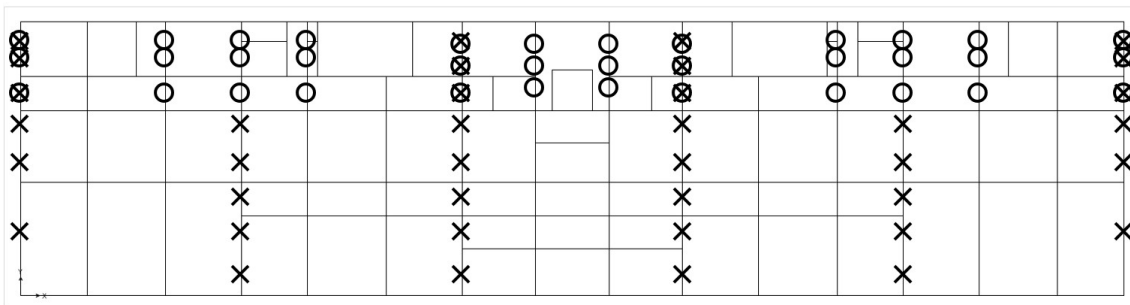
Damper Placement at 3rd floor (SR-Y); MSSSA: 36 dampers;
